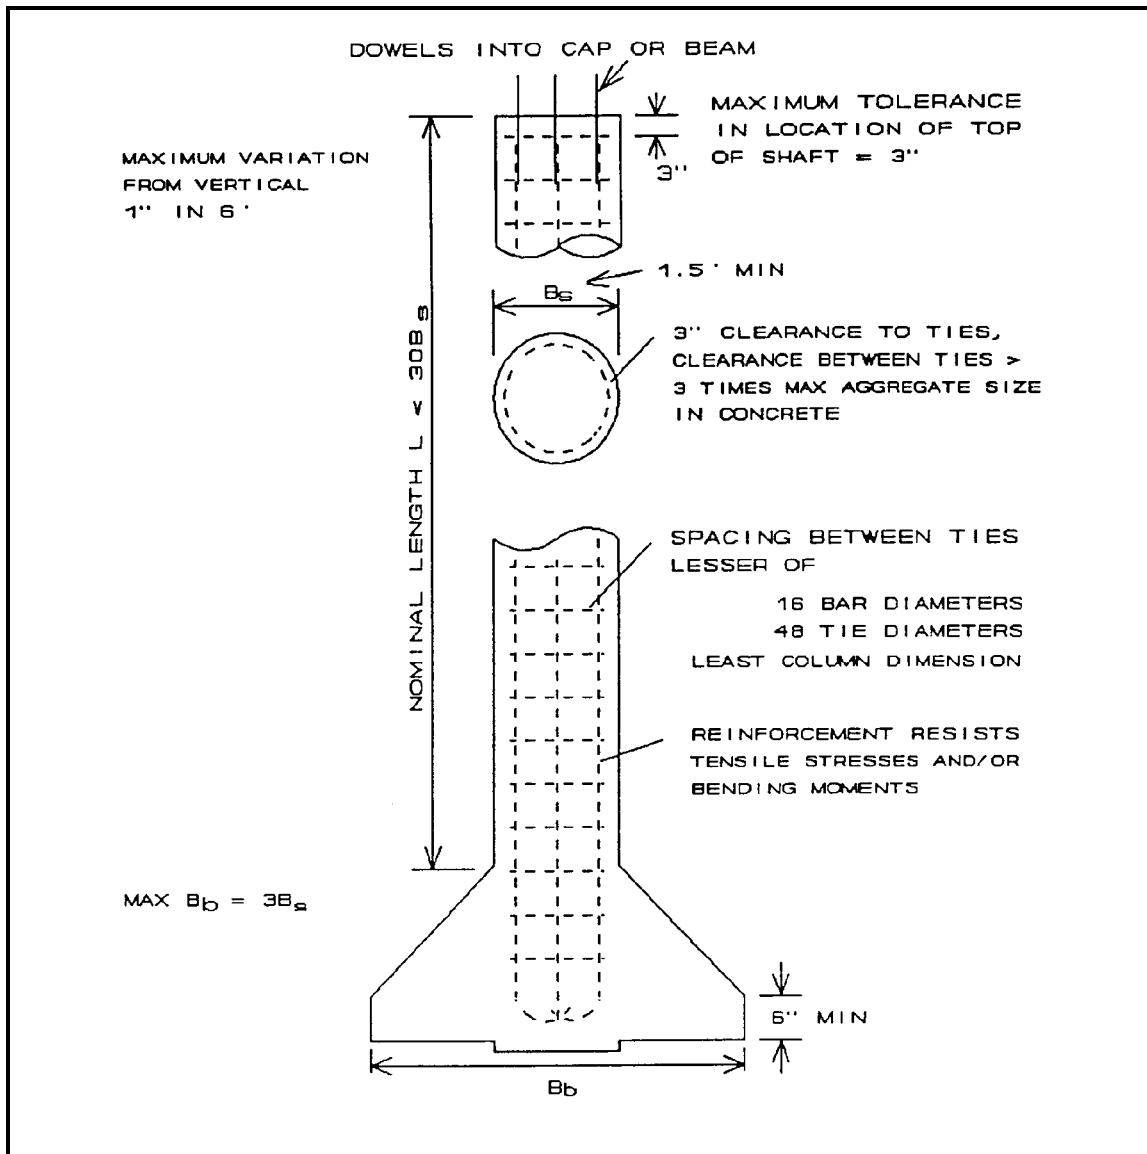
Drilled shaft details (1 in. = 25.4 mm)
